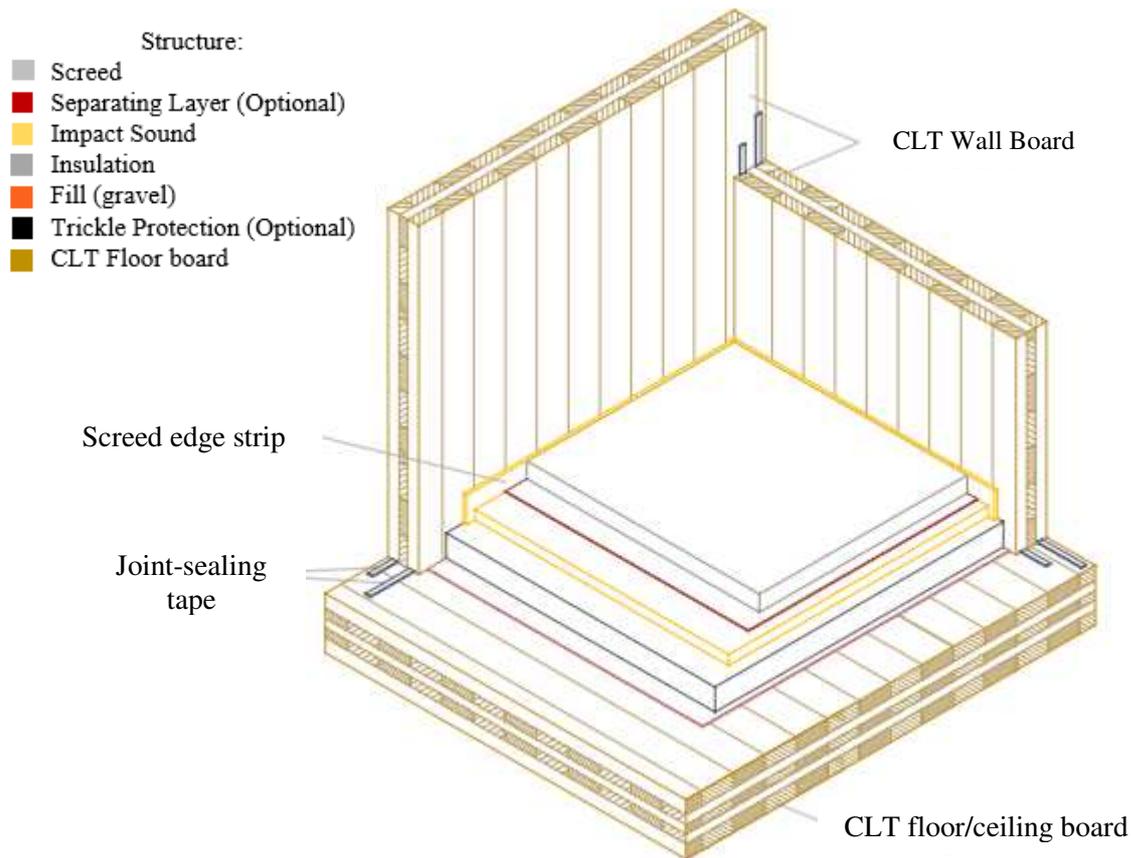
Proposed CLT floor system (Stora Enso, 2015)
